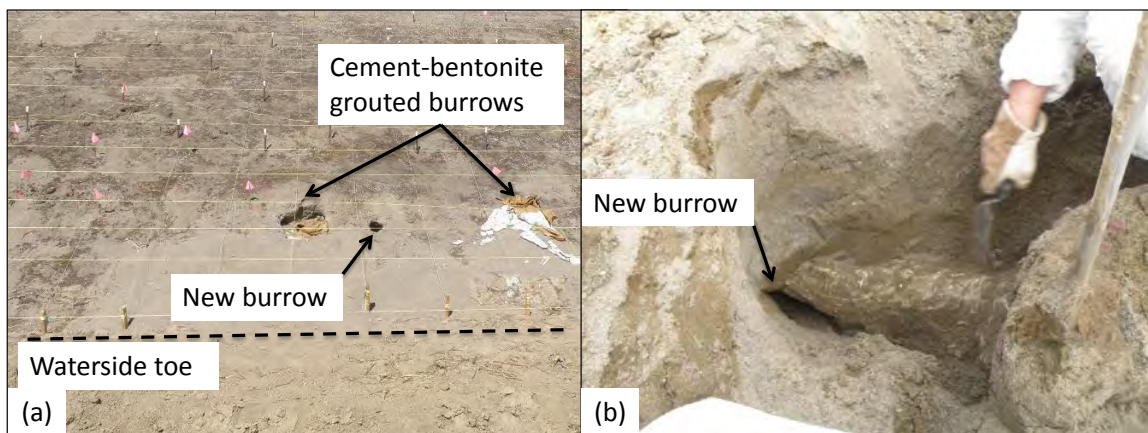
New hole after cement-bentonite grout on waterside toe of the sandy levee Site. (a) shows the location of the new burrow and (b) shows the partially excavated open burrow below the cement-grouted main tunnel.
